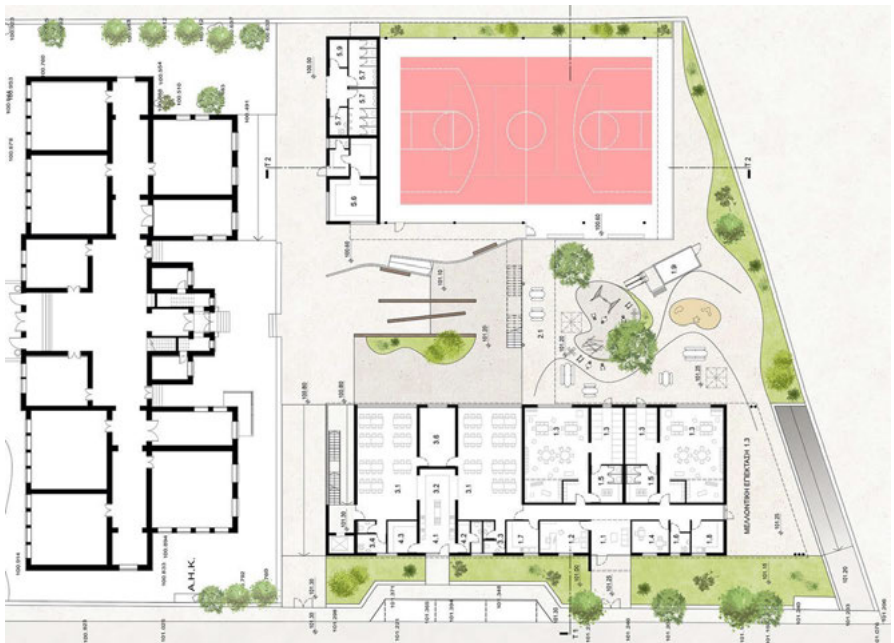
Ground floor plan of the primary school extension. Source: (Authors 2024)
